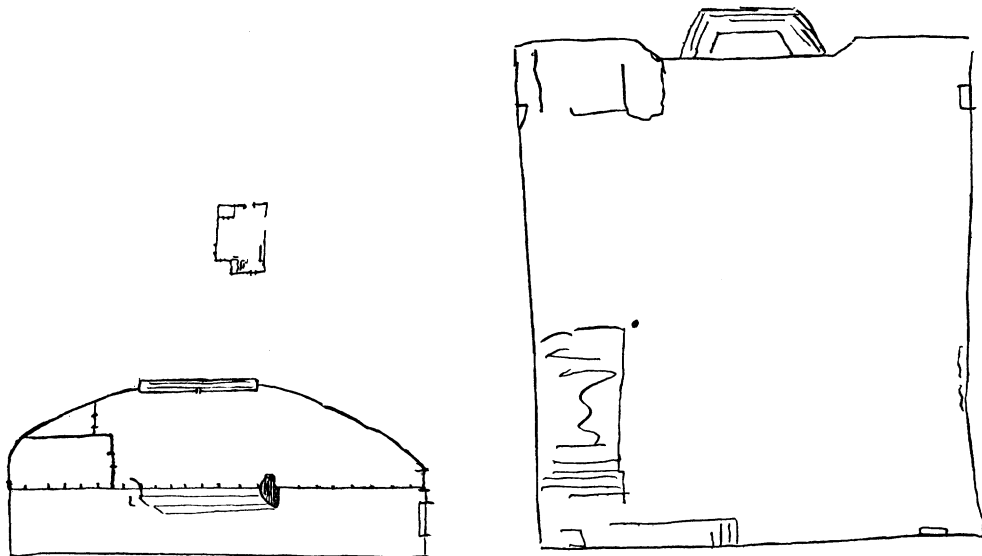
Ground-plans of a hall drawn from memory (scale 1:96).
